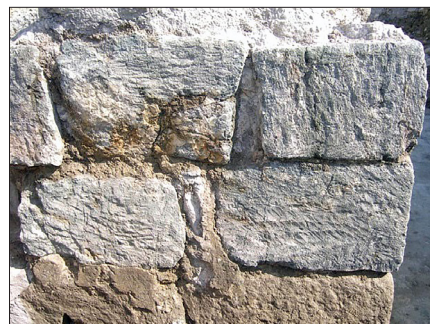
Fragment of the wall cornerstone made of rectangular hewn blocks of glauconitite
